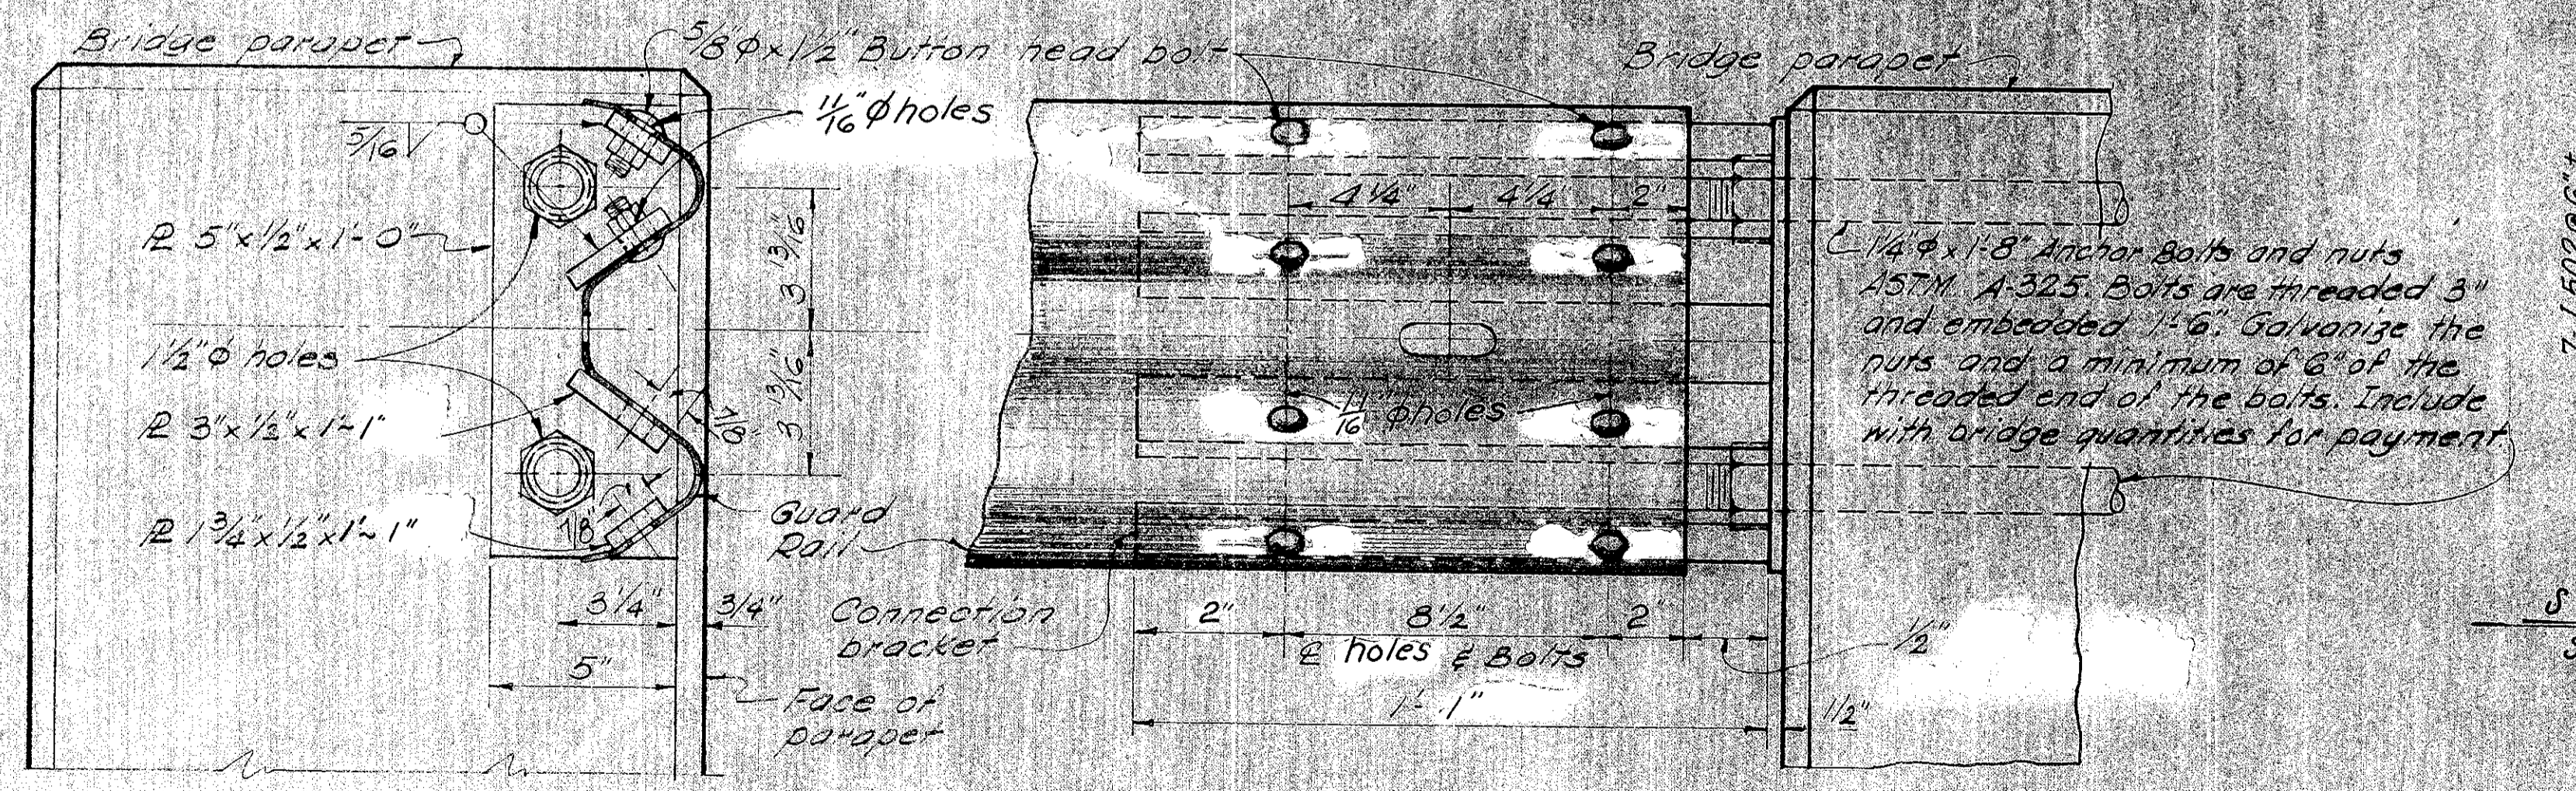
DETAIL OF SPICE IN GUARD RAIL AT MEDIAN ADJACENT TO END DAM
